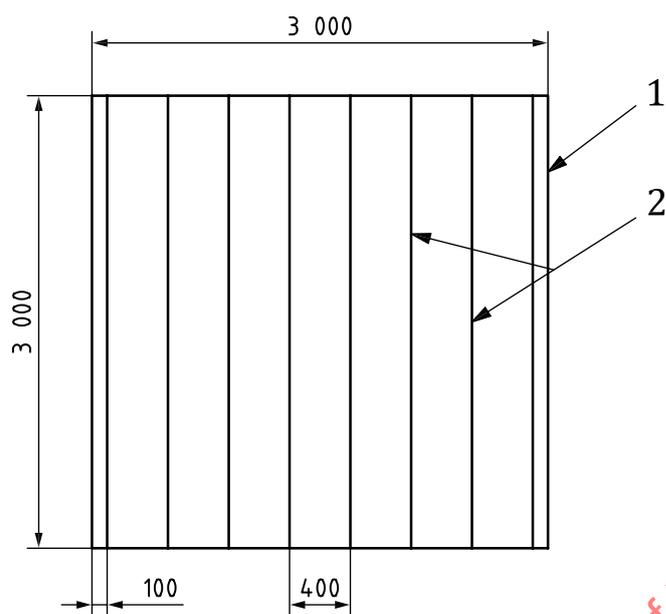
Details of horizontal supporting construction — Layout of inner layer of gypsum board and structural panels
